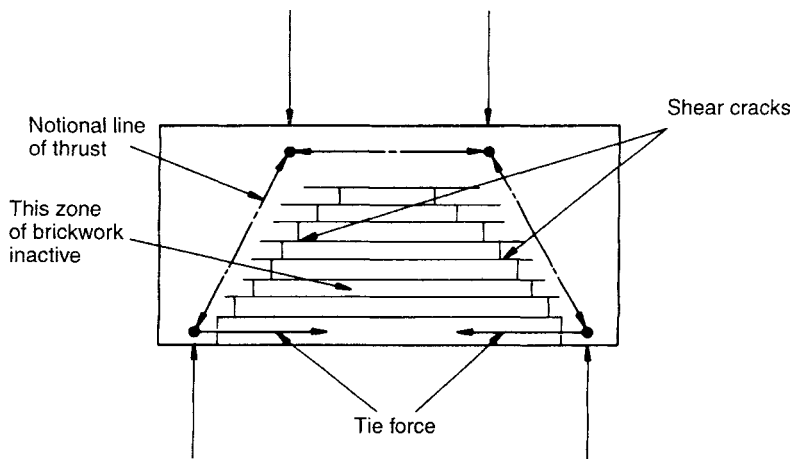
Internal tied arch action in a reinforced brickwork beam having low shear span ratio.
